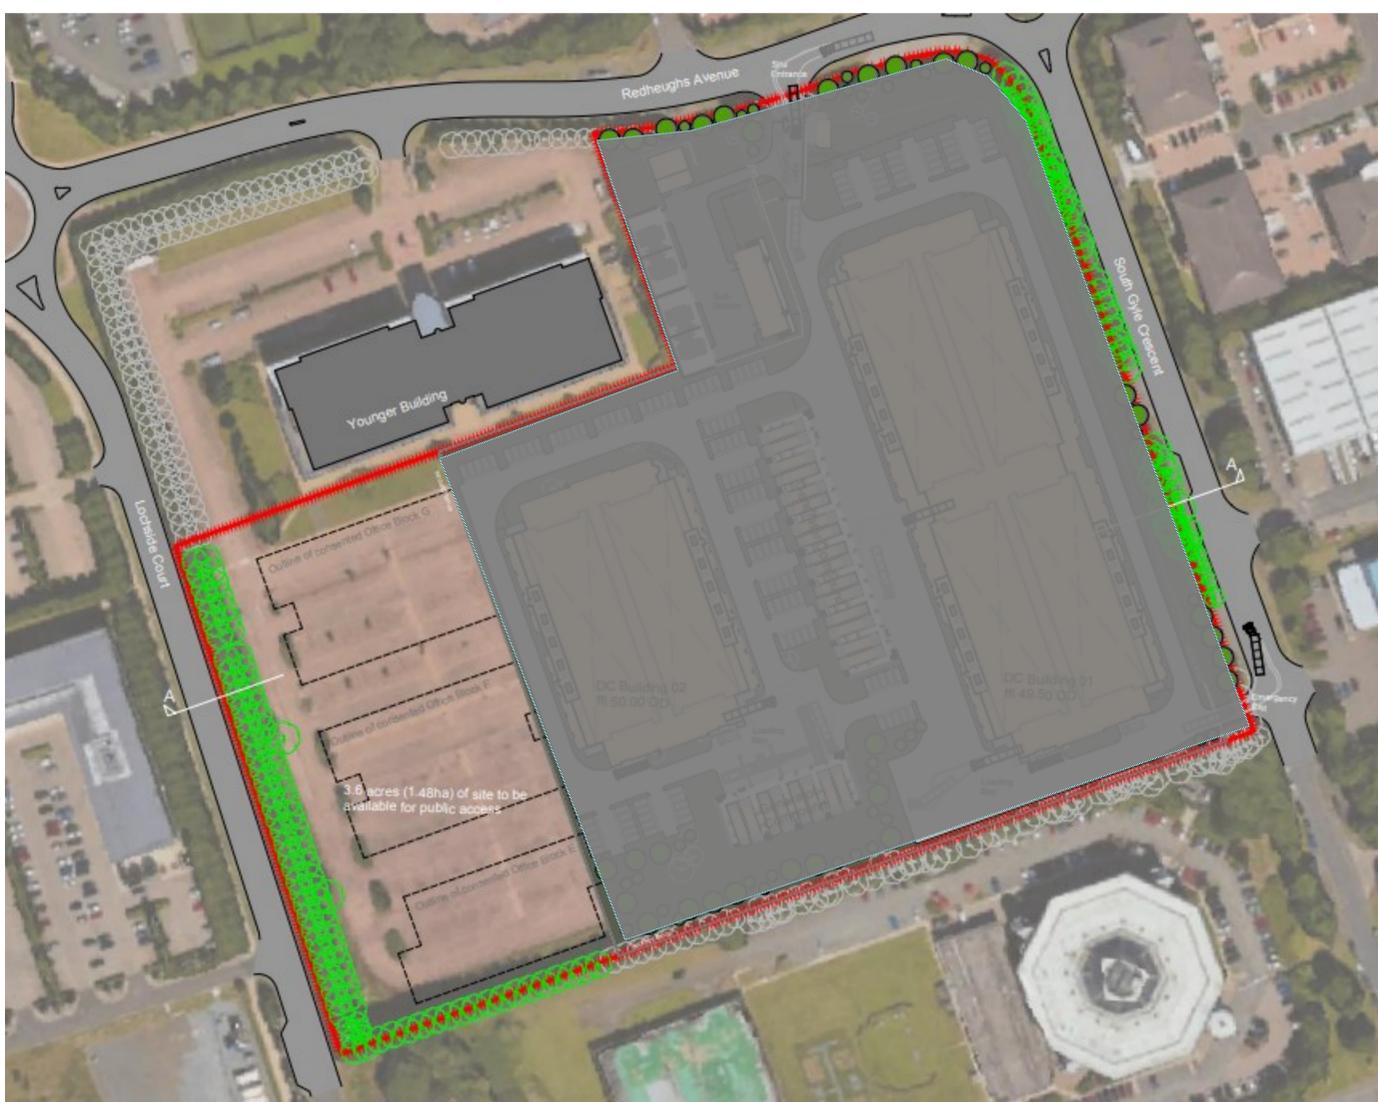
Proposed illustrative open space within development area : Source : studioNWA Architects
